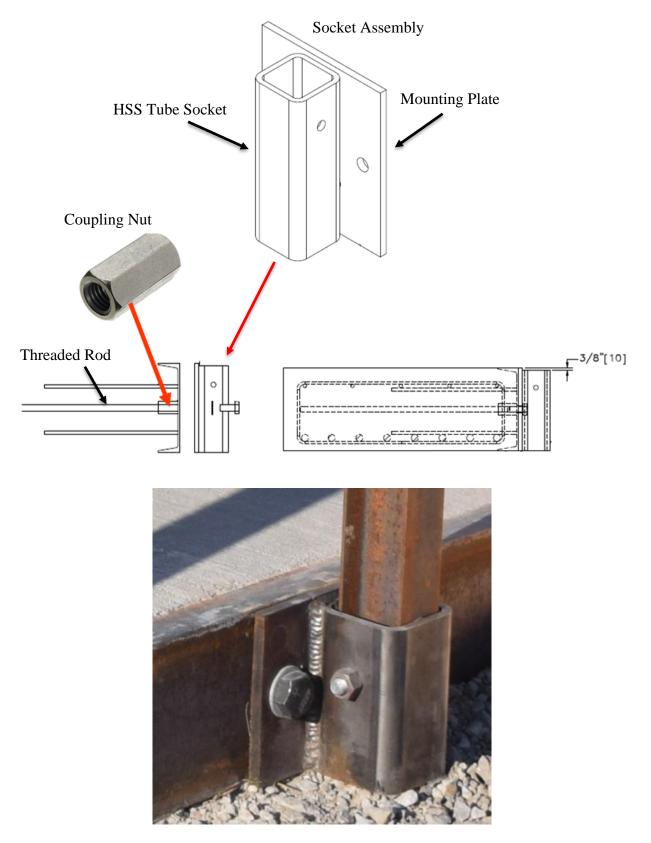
Coupling Nut and Threaded Rod Attachment of Socket Assembly to Deck
